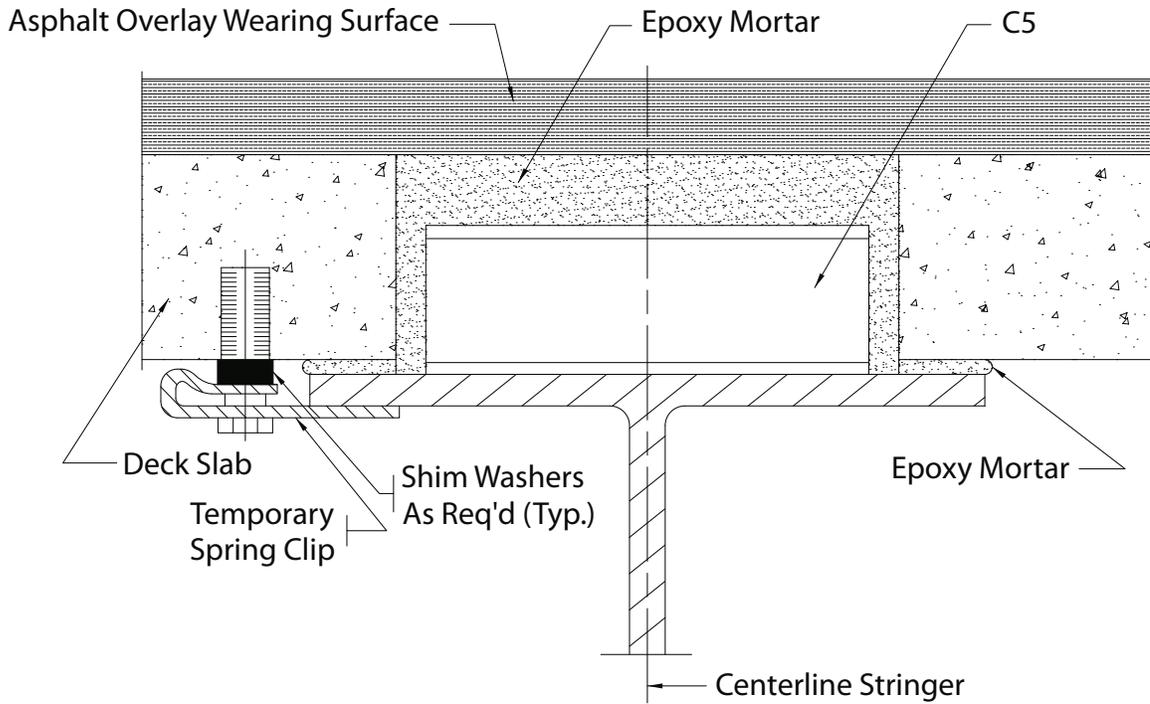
Welded channel section used in the NY Thruway Experimental Bridge.
